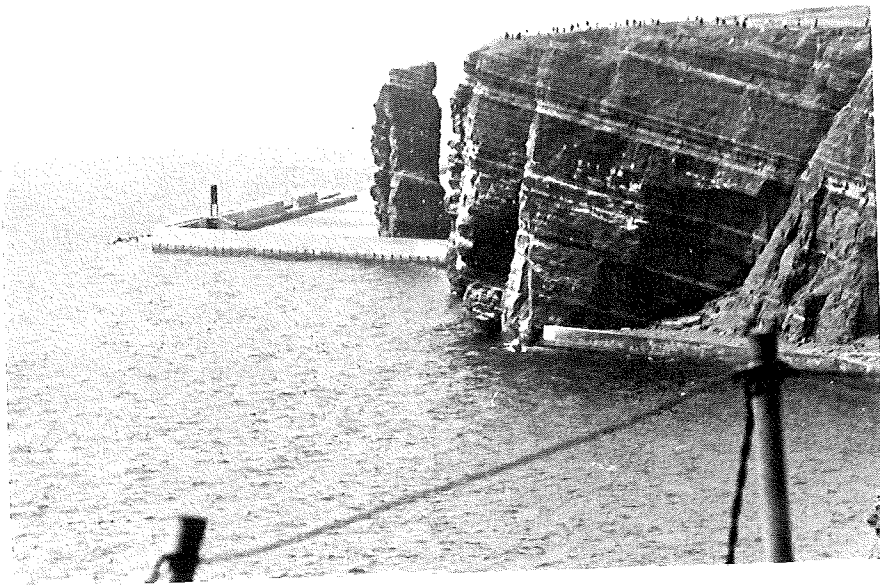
SEAWALL PROTECTING ROCK COAST
